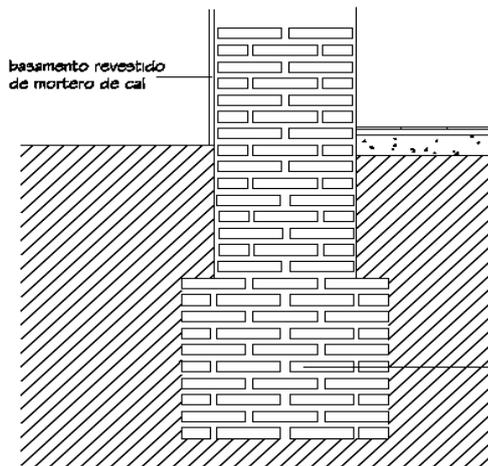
Generic constructive section of foundations from buildings which belongs to Domestic Sevillian Architecture between 18th and 19th centuries
